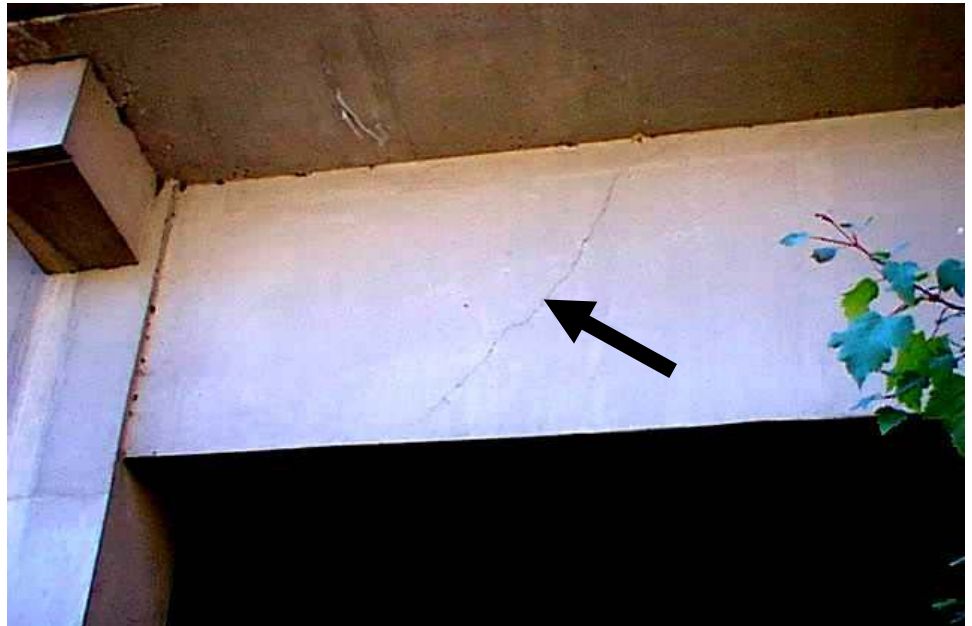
Diagonal Shear Crack in Web of Beam
